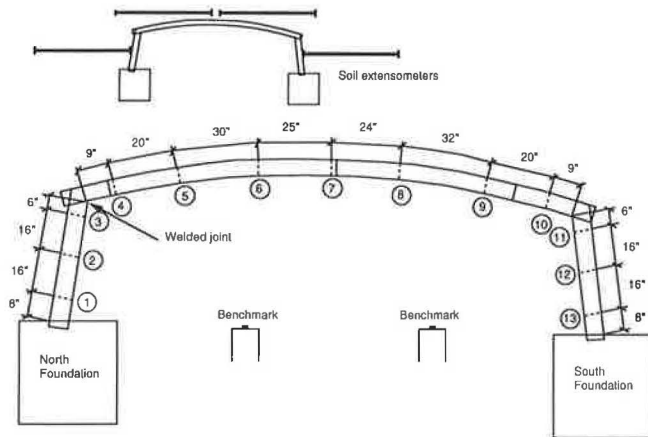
Cross section of test culvert showing 13 instrument locations and 4 soil extensometer locations.
